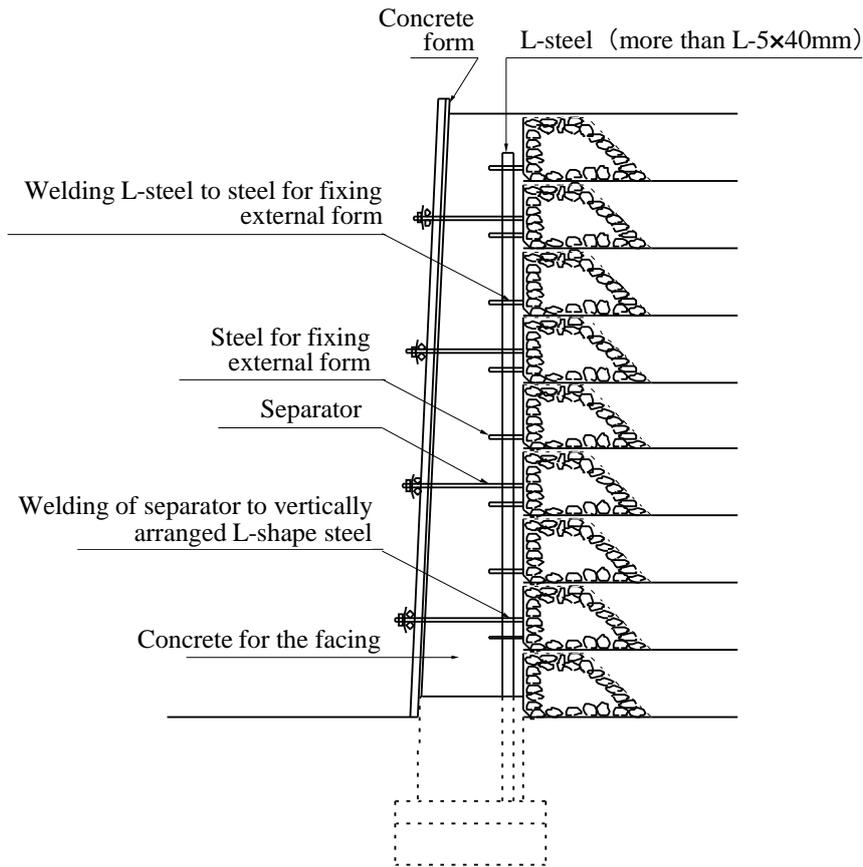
Example of the method to fix concrete form for the facing construction using welded steel fabric
